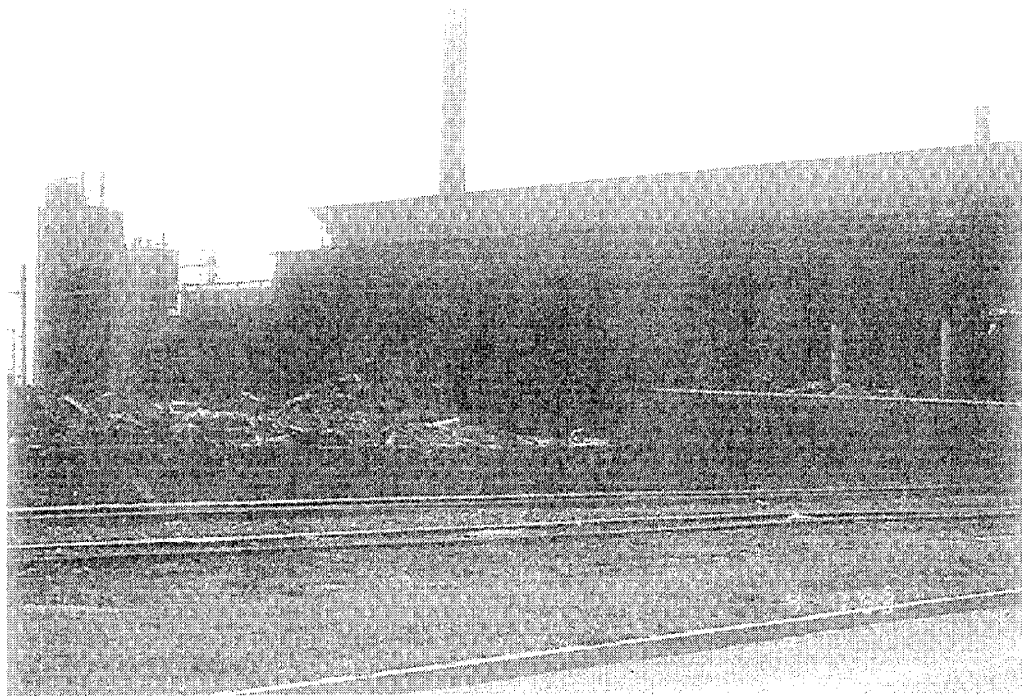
View of the Hazorb Site showing the building shell from College Avenue, facing southwest.
